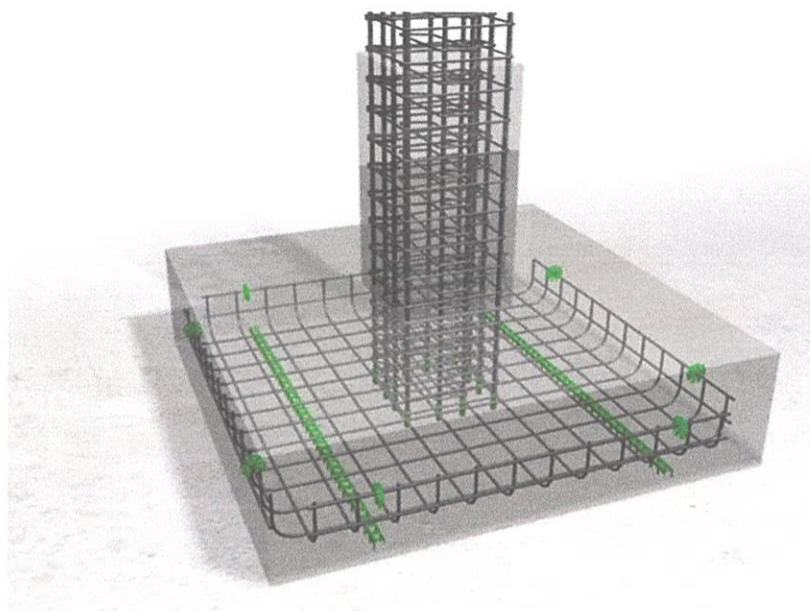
The example of reinforcement bar of pile cap and column stump
